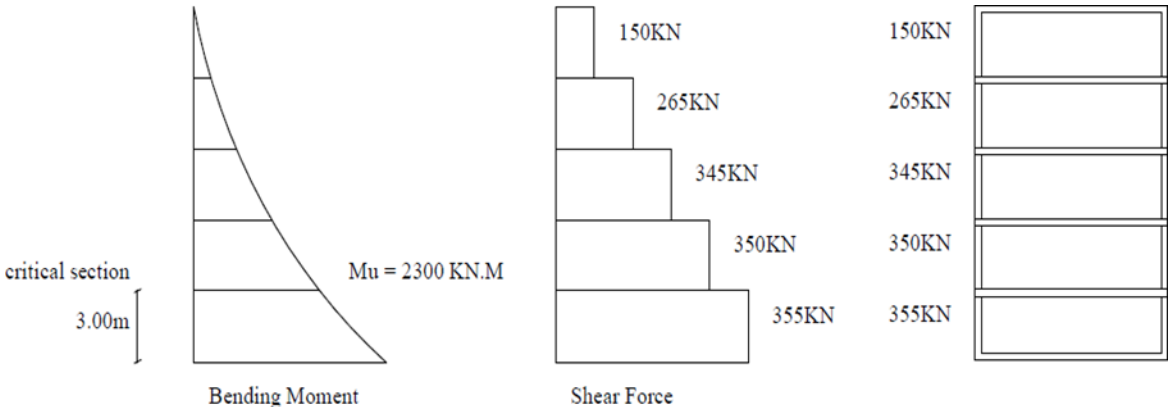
Shear and Moment Diagrams of Shear wall
